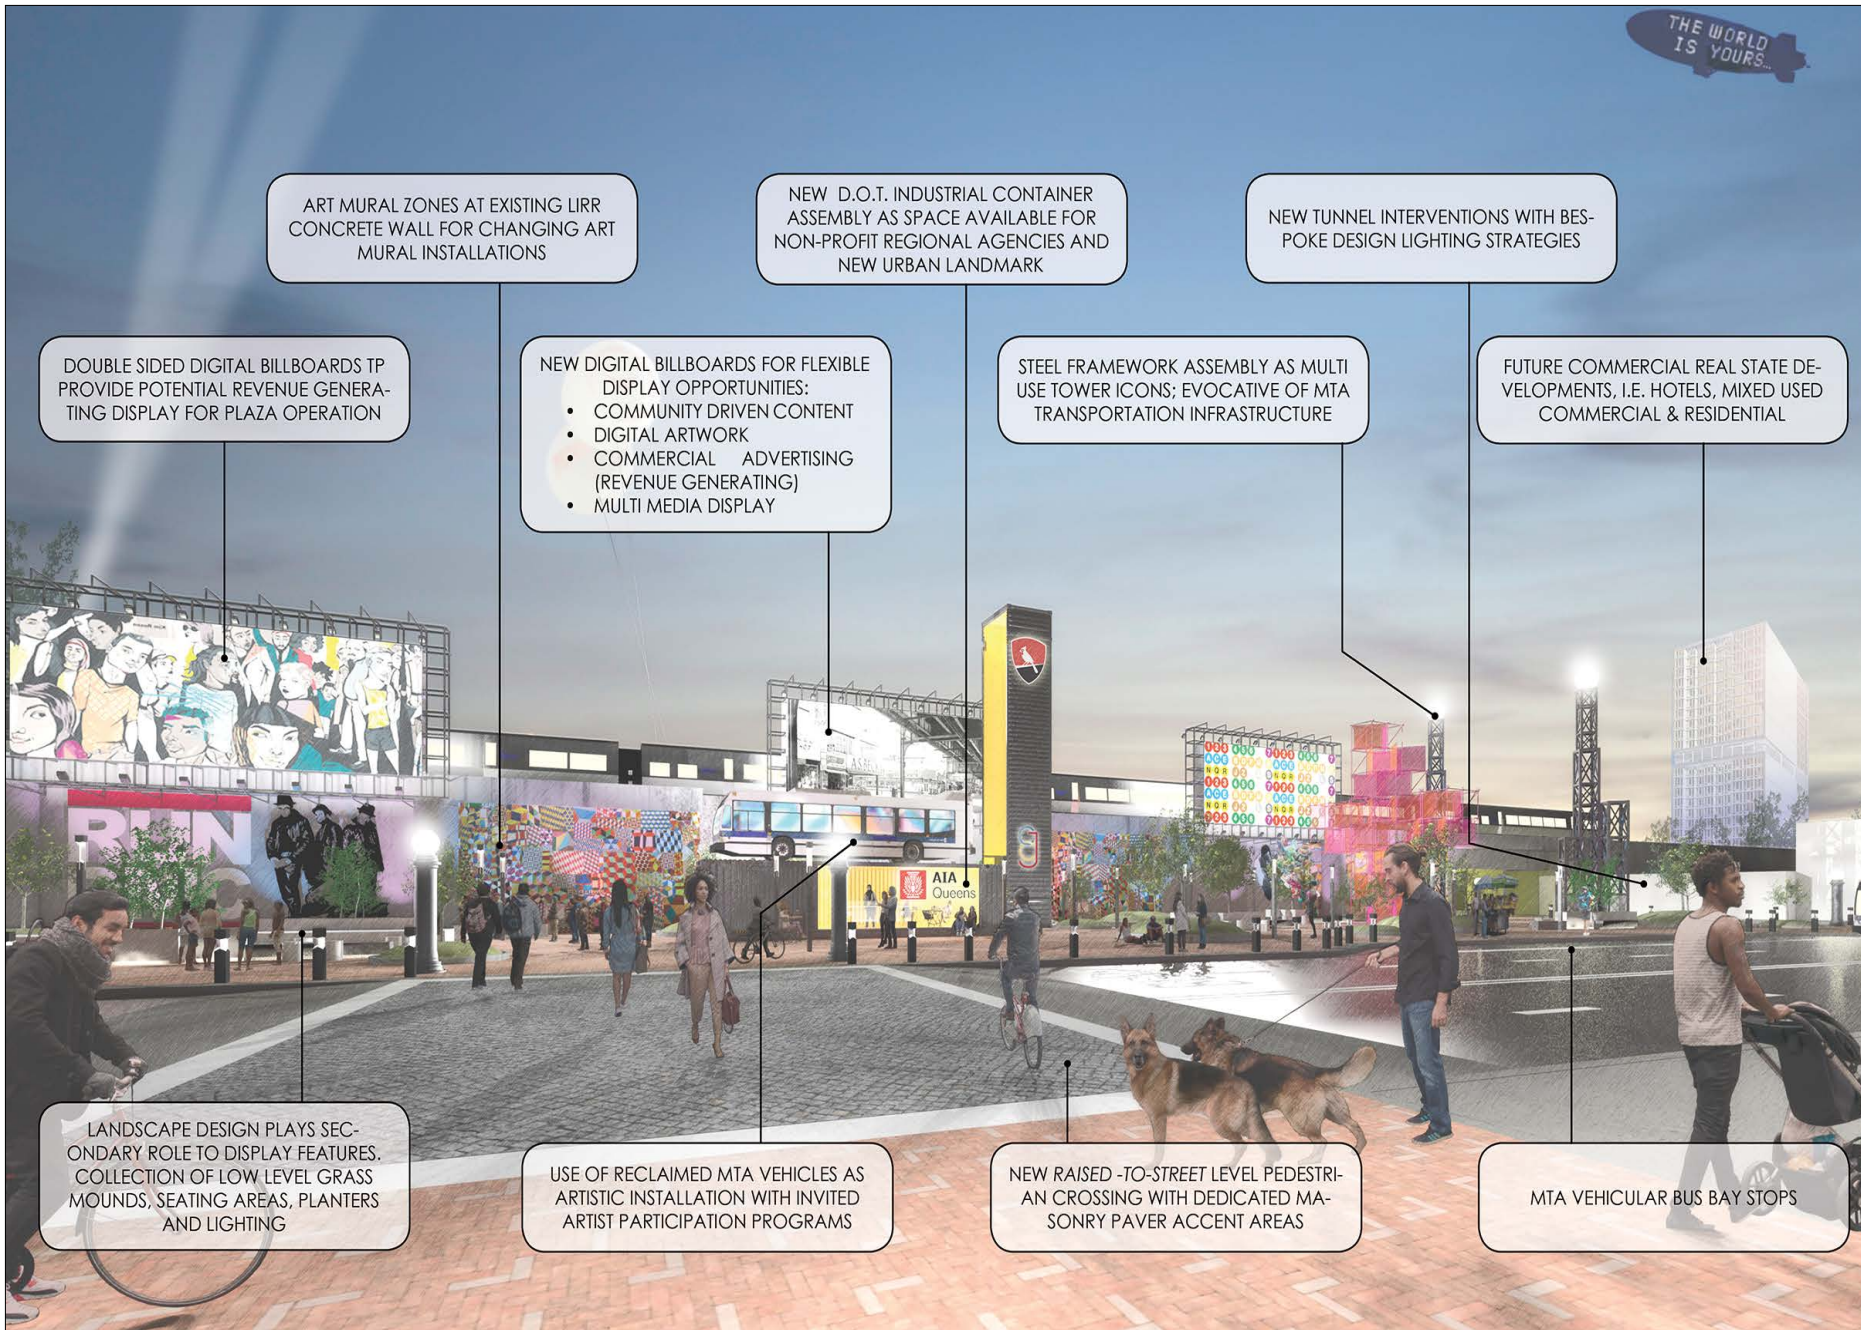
Streetscape Plan - Pedestrian Corridor Towards Archer Avenue
